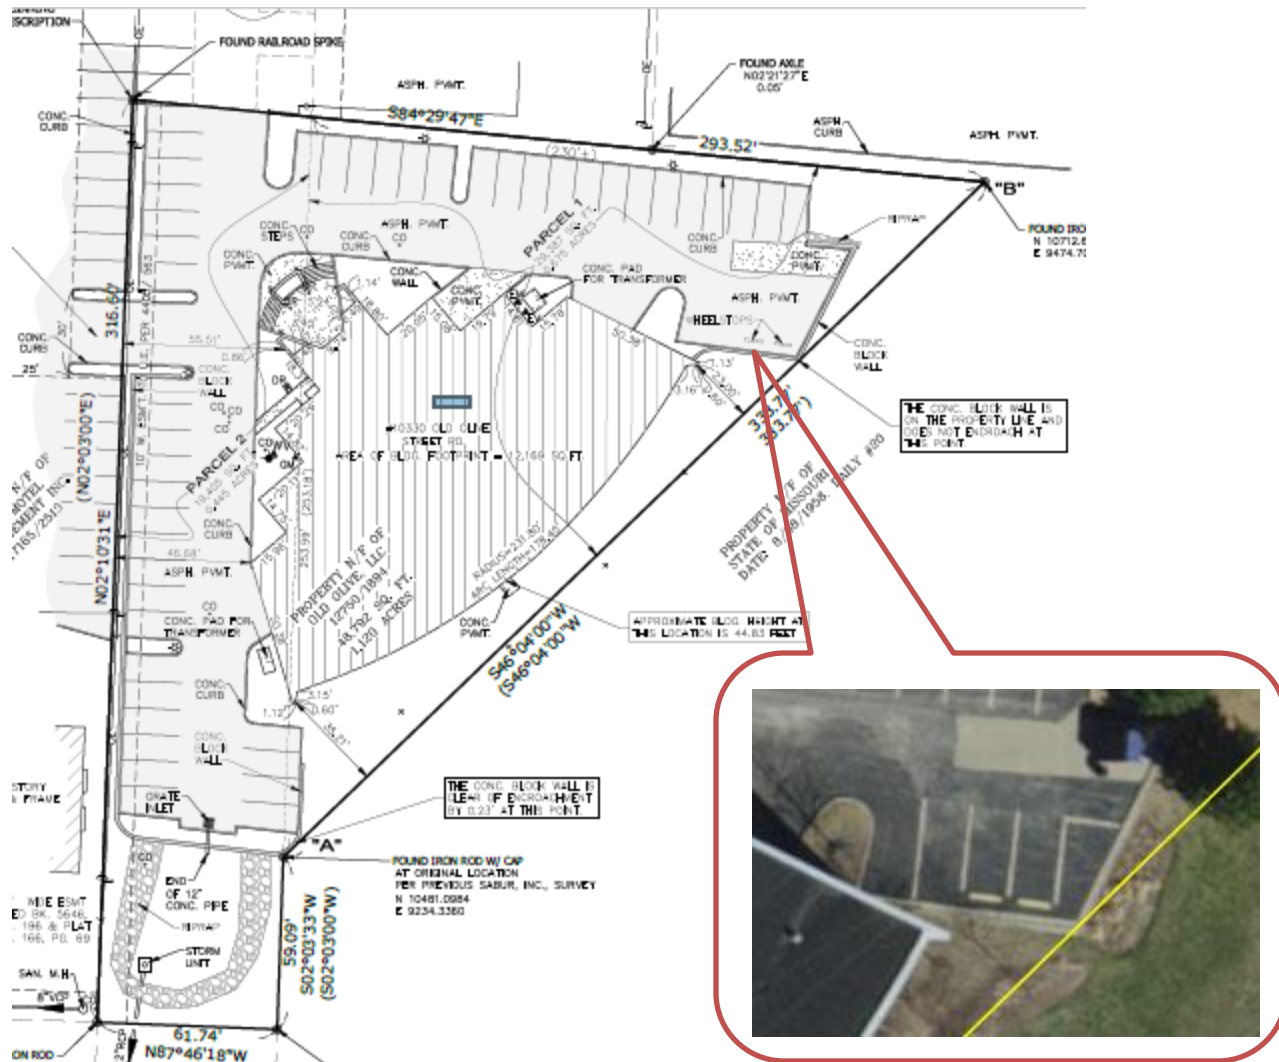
Site Plan of 10330 Old Olive Street Road. The aerial image shows the 4 blue striped spaces that are not shown on the site plan for a total of 50 surface parking spaces.
